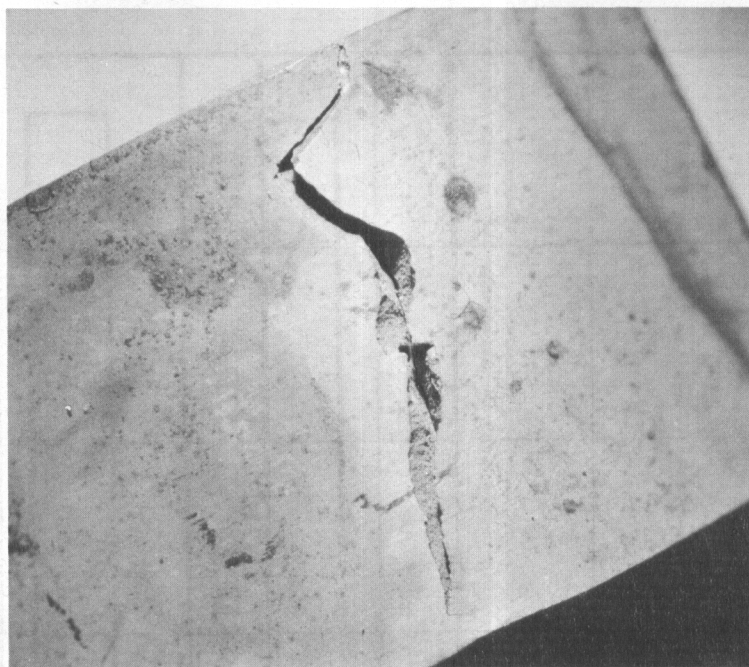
SHEAR FRACTURE DEVELOPMENT IN
